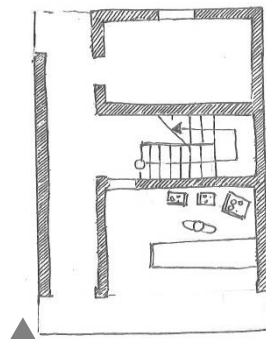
Alternative plan building (Shock Safe Nepal group 1).
